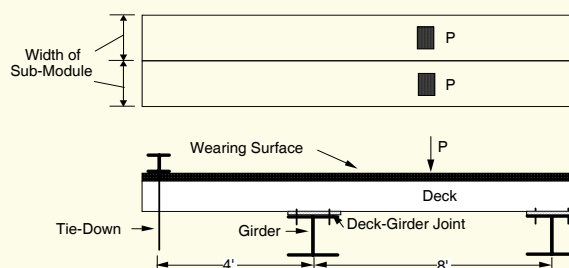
Schematic of Test Setup for Deck-to-Deck Connection
